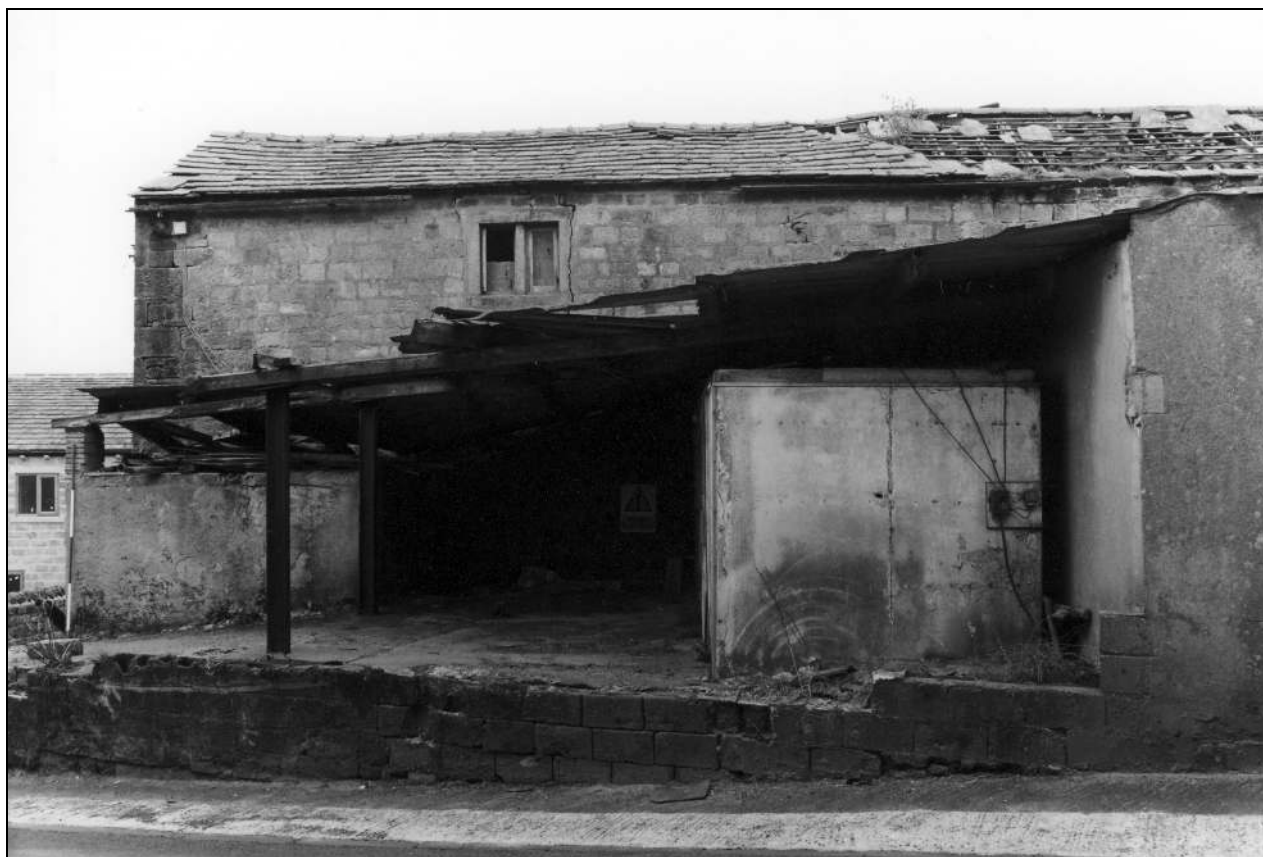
North range: north elevation (east part) (film 2, frame 3)
